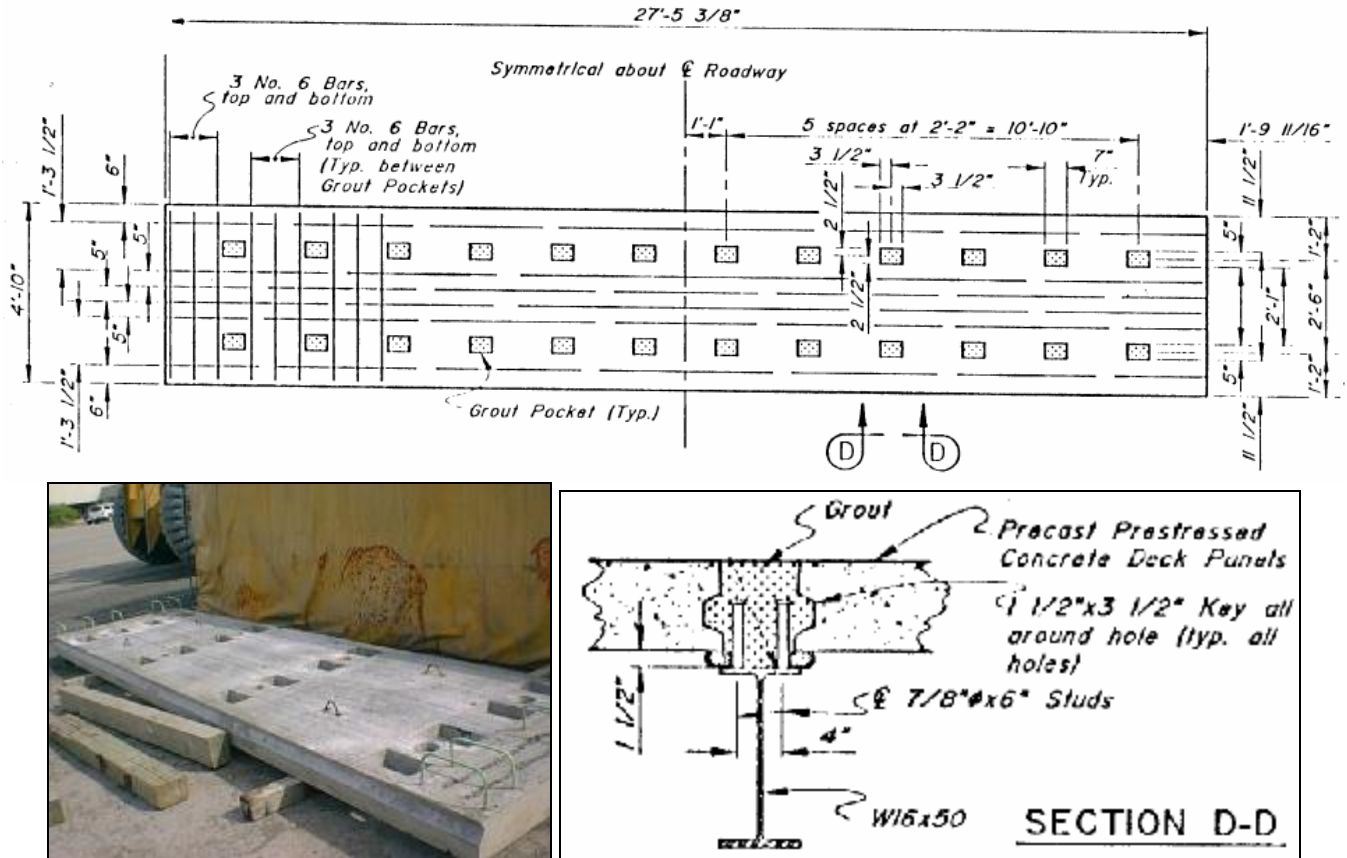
Plan view and section d-d of the precast panel
